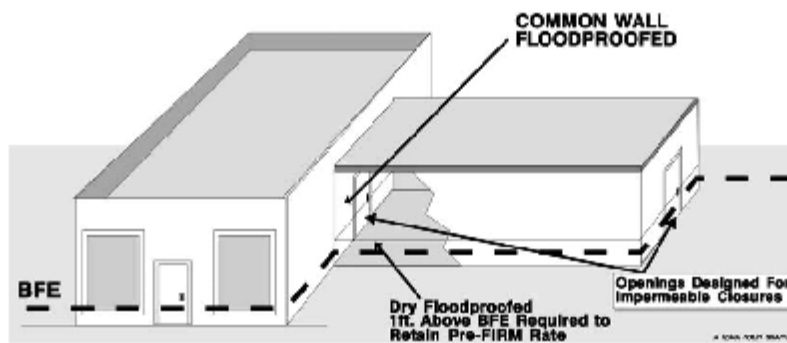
Lateral addition to a nonresidential building in an A Zone.
